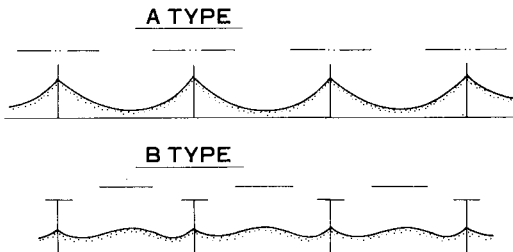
Typical layouts of structures for the protection of an artificial beach
